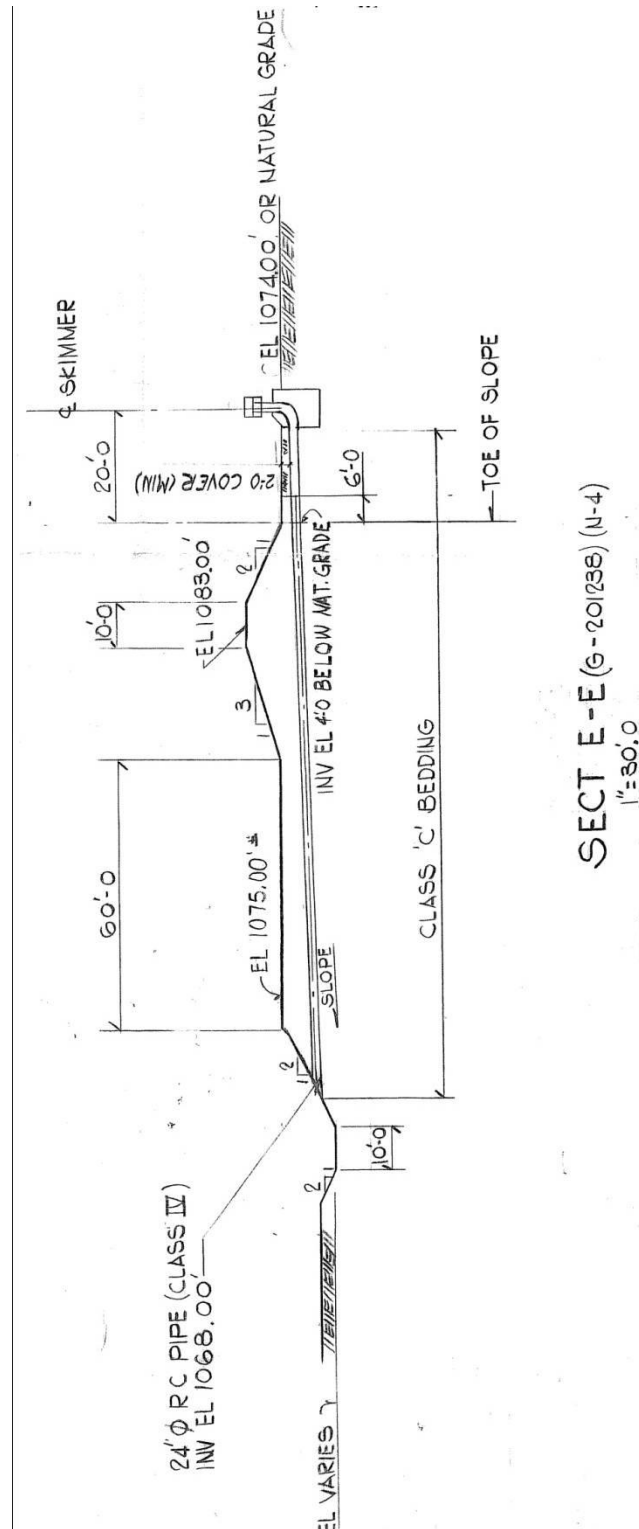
REPRESENTATIVE DESIGN SECTION OF POND 2 PERIMETER DIKE EMBANKMENT
